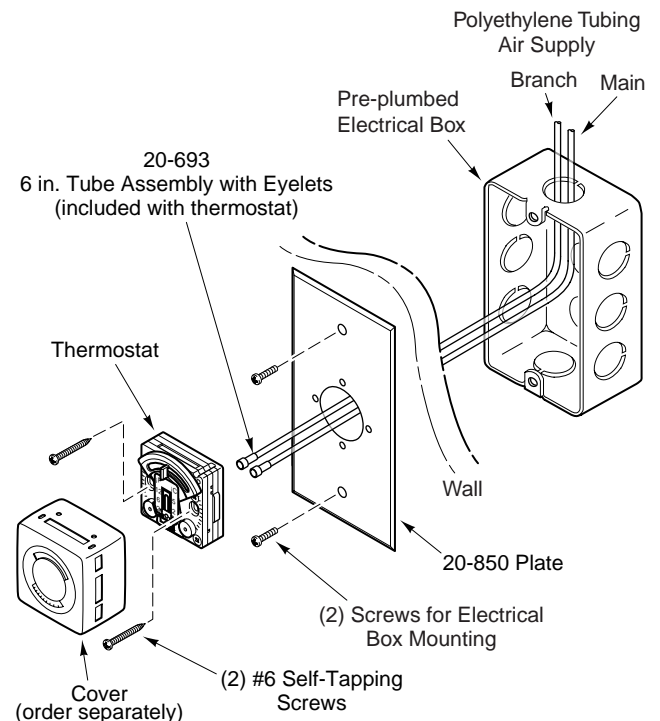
Flush Mounting of Thermostat, Using 20-850 Plate
